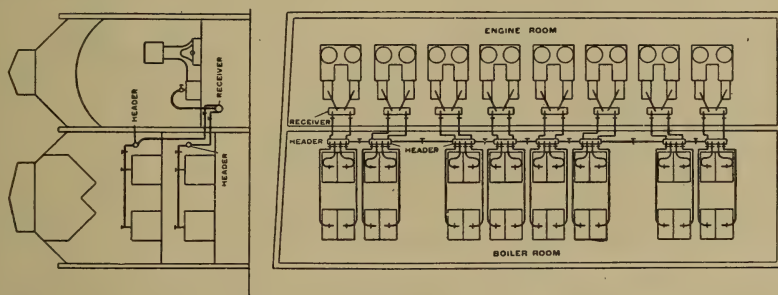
General Arrangement of Steam Piping, Manhattan Elevated Station.
